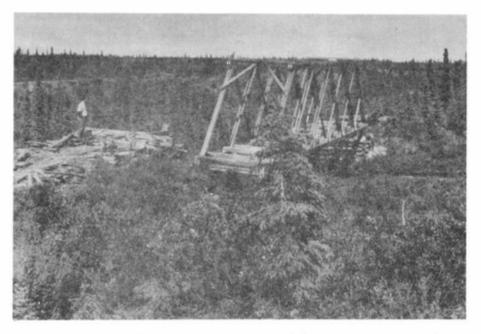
Brushkana Creek Bridge. Built in the 1940's, this wooden truss bridge was never used. (BLM photo.)
